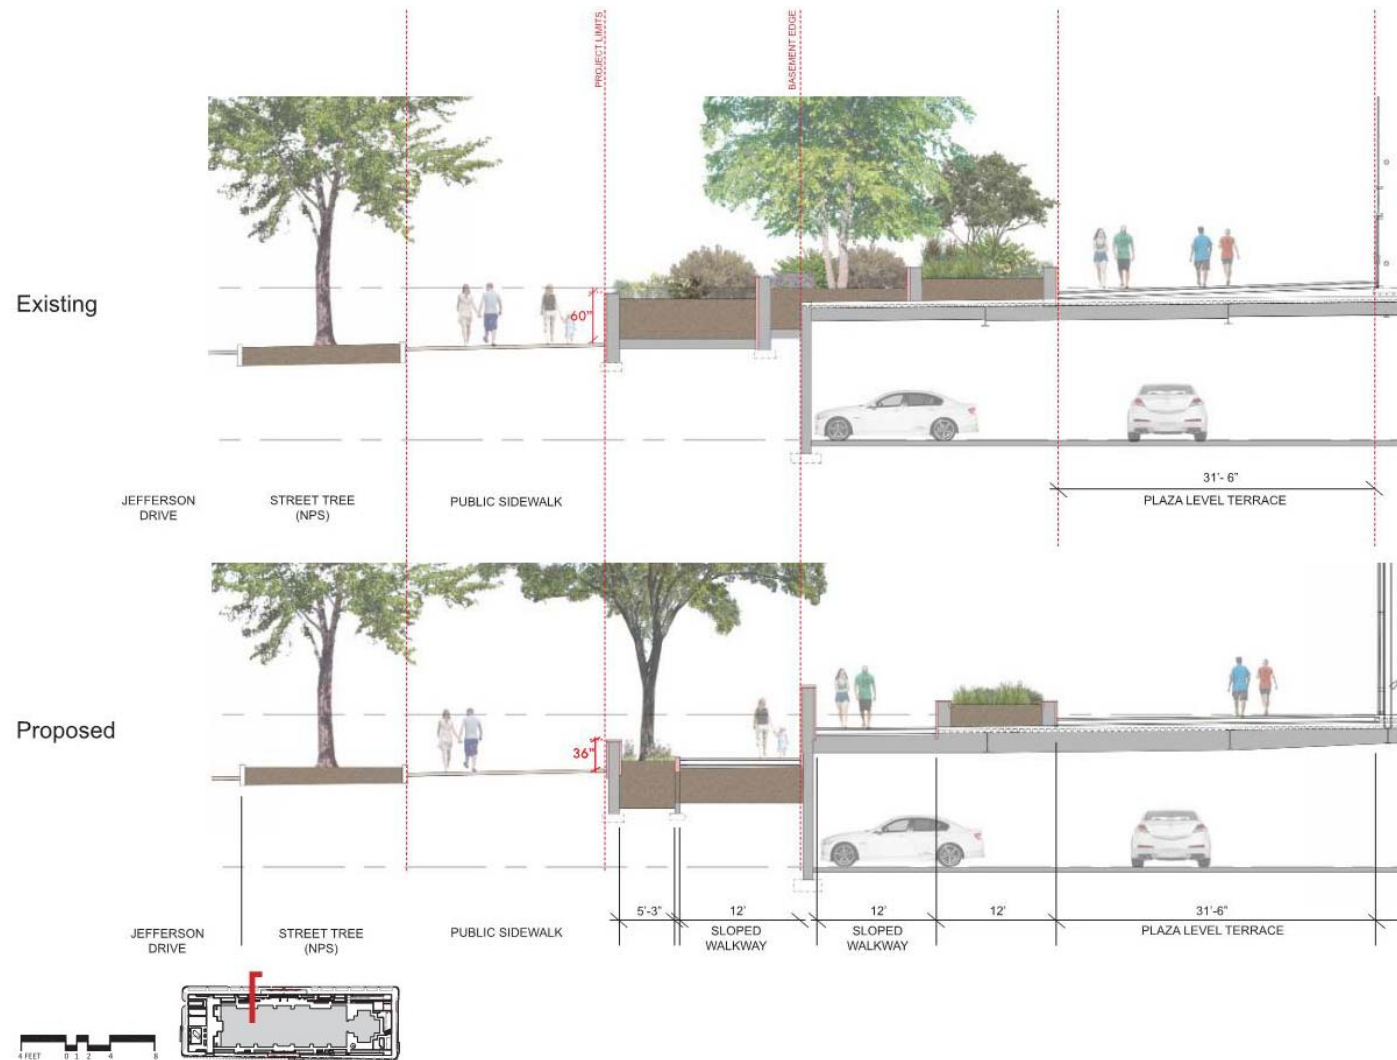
27: North Entrance Section, Existing and Proposed Condition. (Source: AECOM.)
